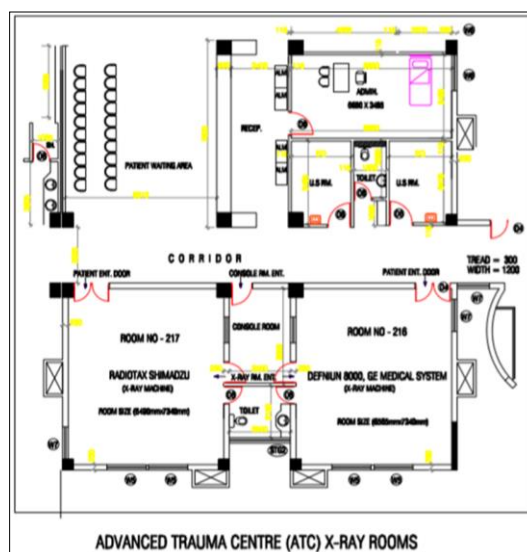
layout plan of Advanced Trauma Centre (ATC)
